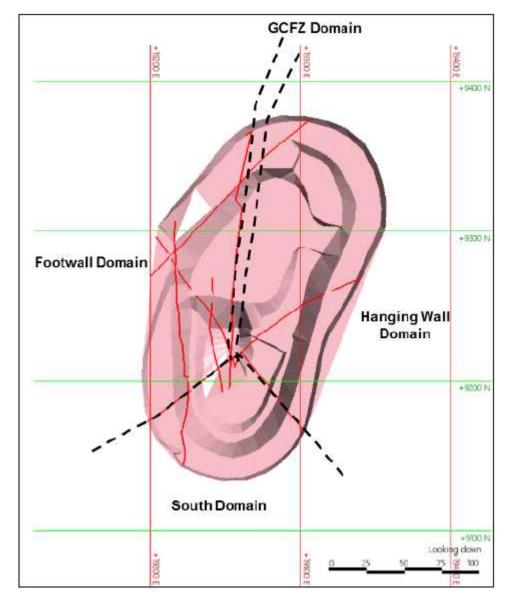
Plan view of existing pit showing the geotechnical domains used for rock mass characterisation
